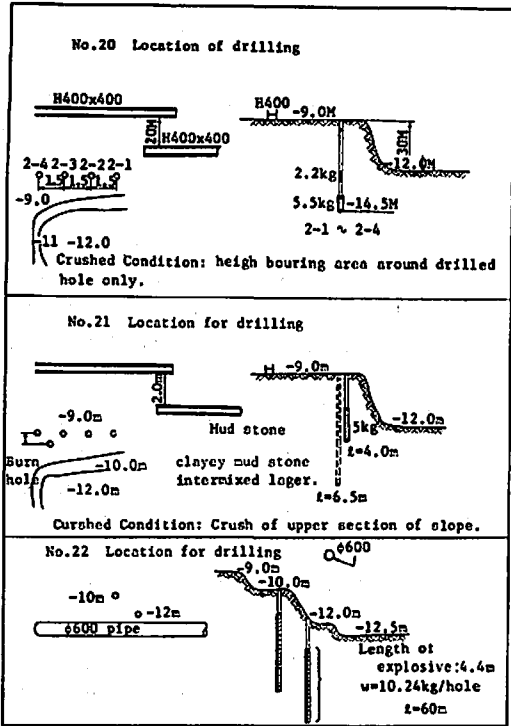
(3) Drilling and charging pattern as well as arrangement of pressure gauge.
